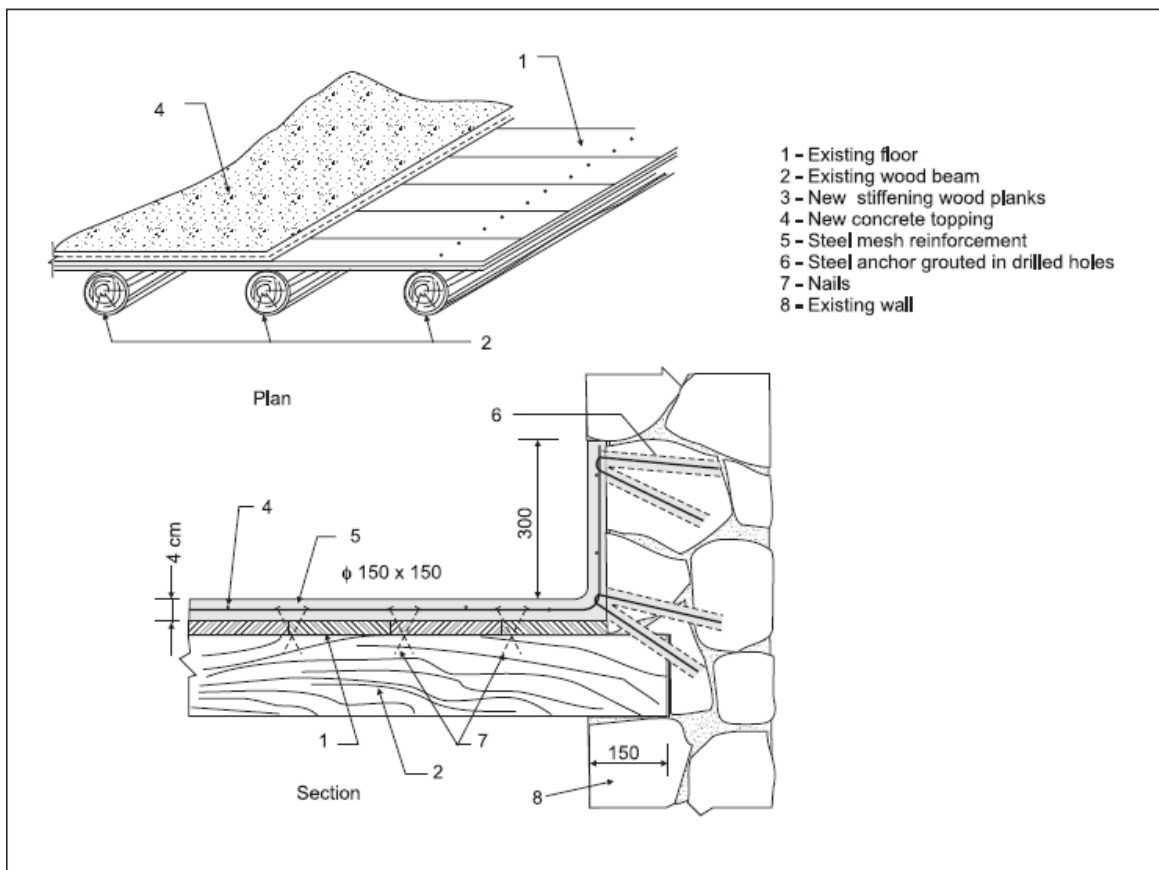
a Stiffening wooden floor by reinforced concrete slab and connection to wall
